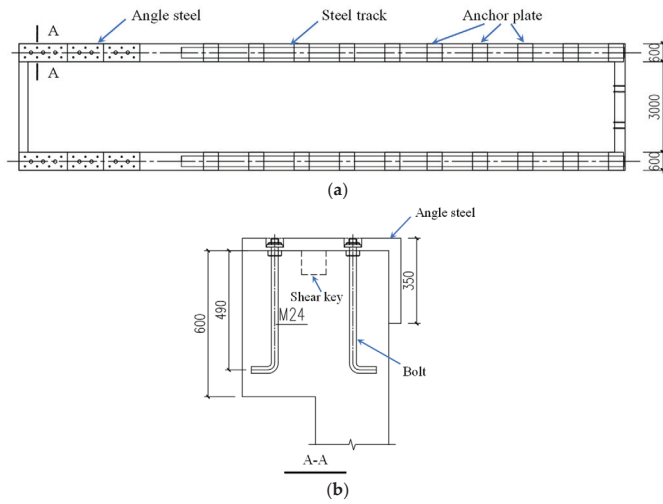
Plan view of the soil tank (a) arrangement of angle steels and steel tracks and (b) connection between steel angle and soil tank.
